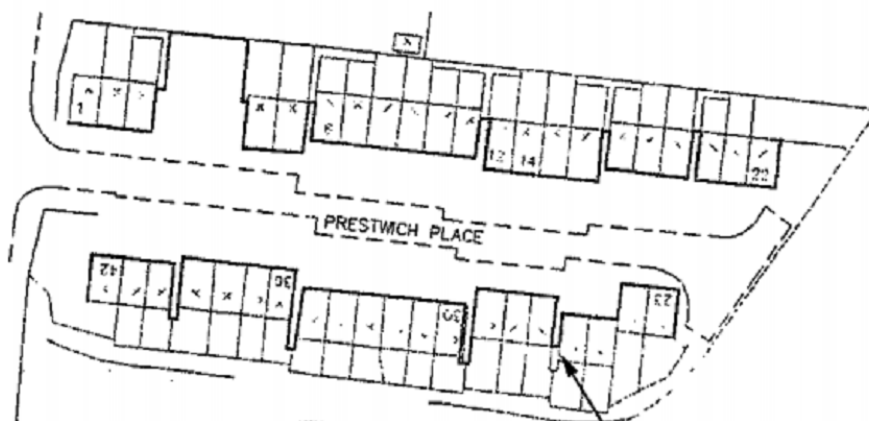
formation of street edge with building frontages and other built up structures (source: Cooper 2005)
